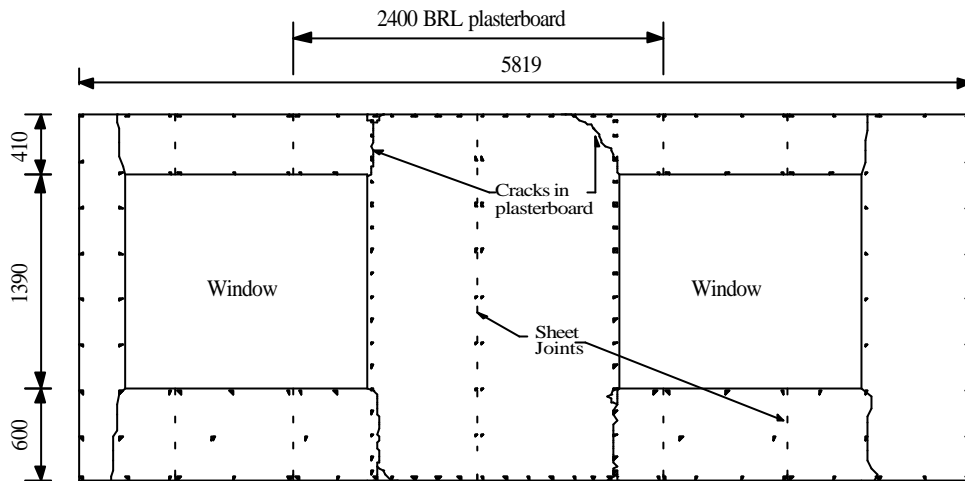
Plasterboard cracks formed in the East Wall (Wall1)
